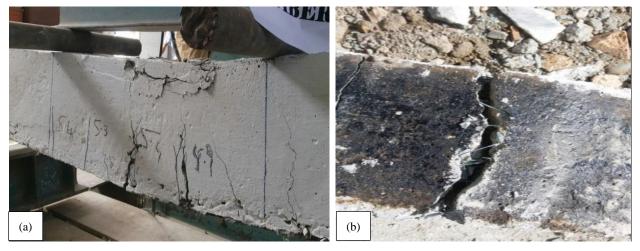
Failure of a) SFRC beam, b) crack bridging action of RSF at the tensile face of RC beam
